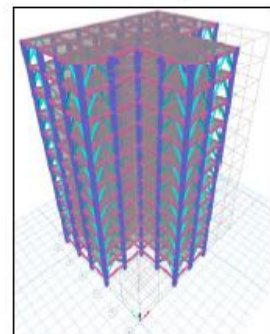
3D View of T Shaped building with Inverted V Bracing
